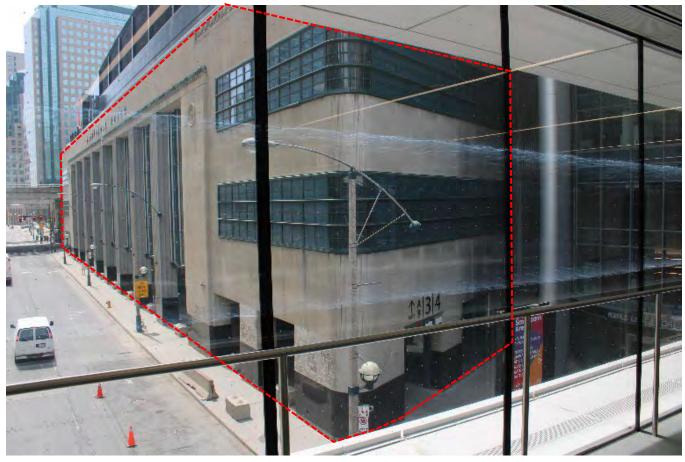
Location of the heritage attributes of 40 Bay Street (east and north elevations)
